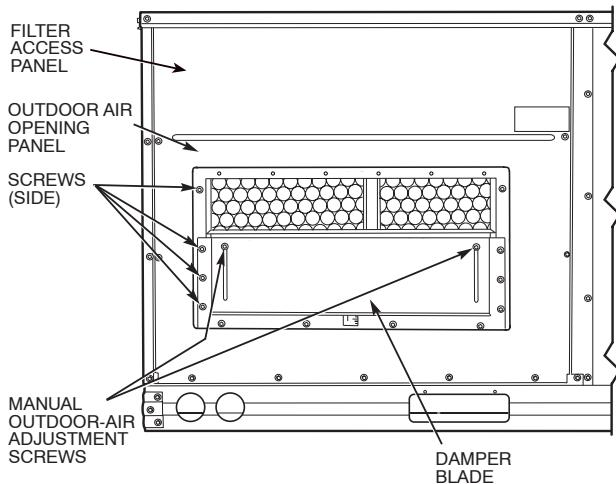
Damper Panel with Manual Outdoor-Air Damper Installed
